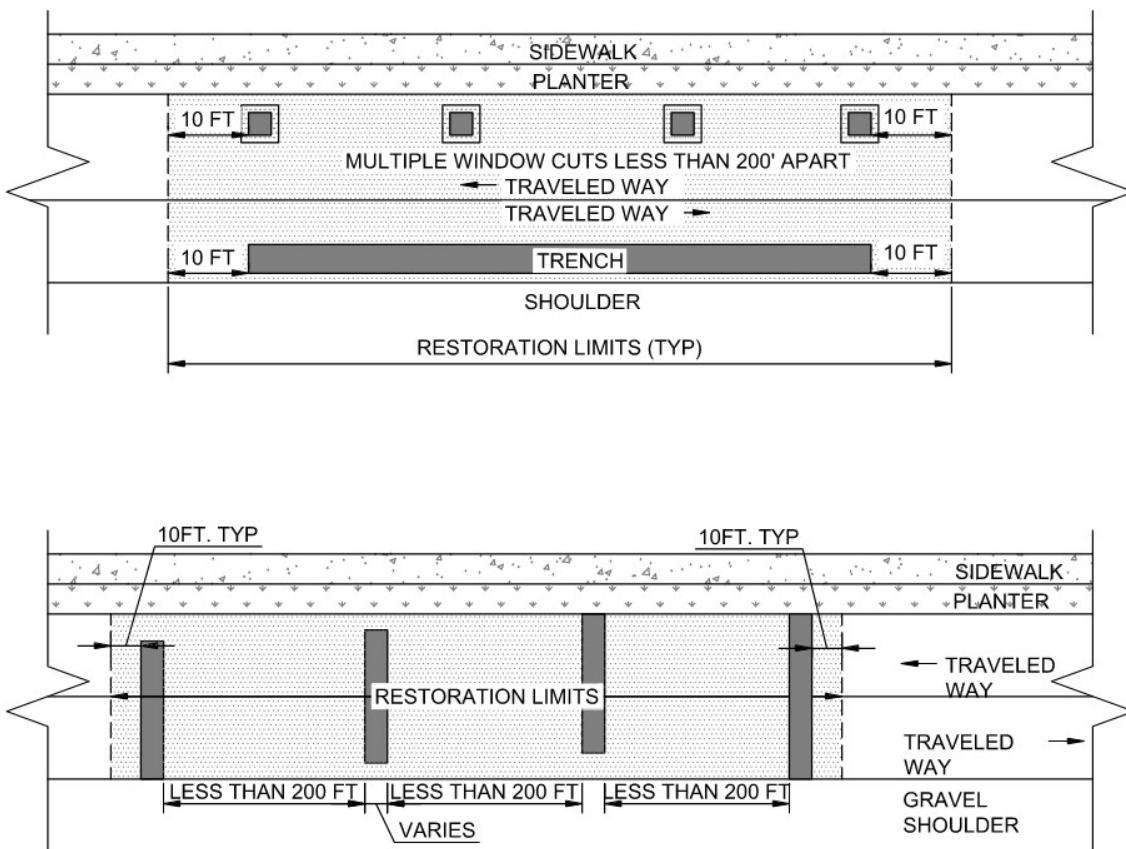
2 Full-Width Overlay Limits for Multiple Trenches and Window Cuts
